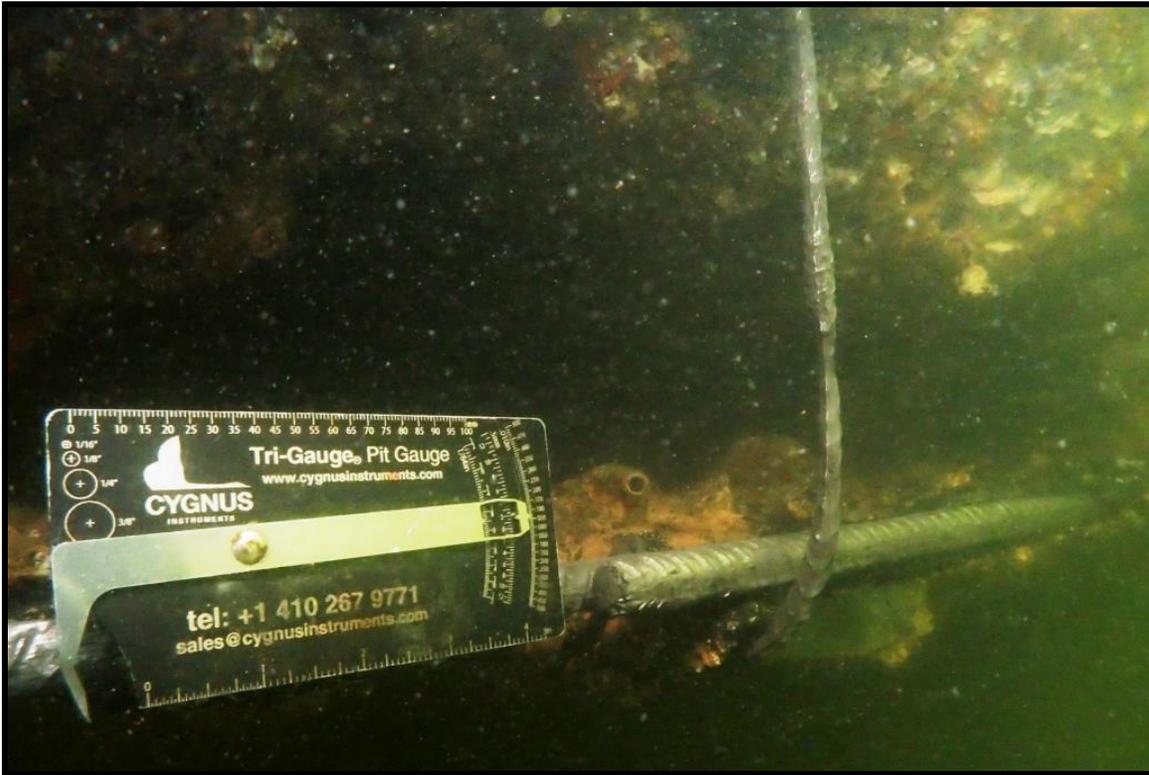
Station 4+55 Concrete pile cap with large spall and exposed reinforcing.
